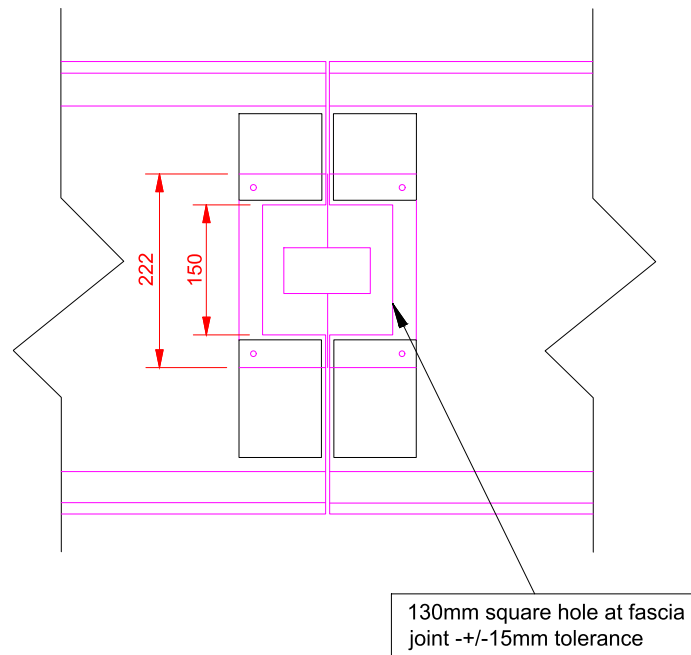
Tolerance displayed on a drawing for the steelwork
